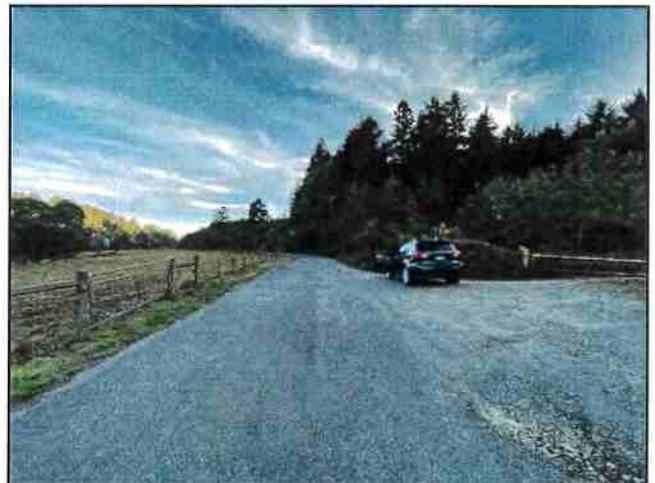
Williams Creek Rd Looking North @ Driveway and Pullout Location
